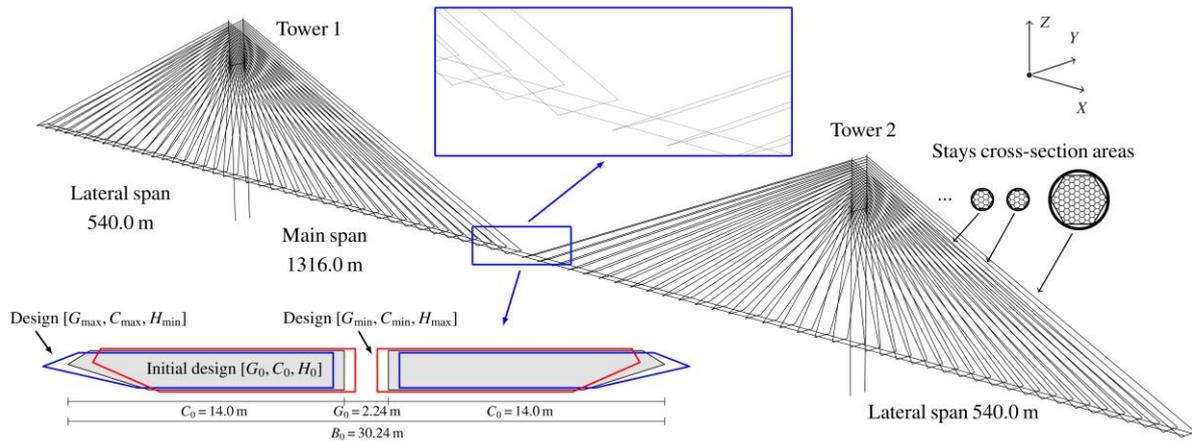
Layout of the parametrized FEM of the long-span cable-stayed bridge
